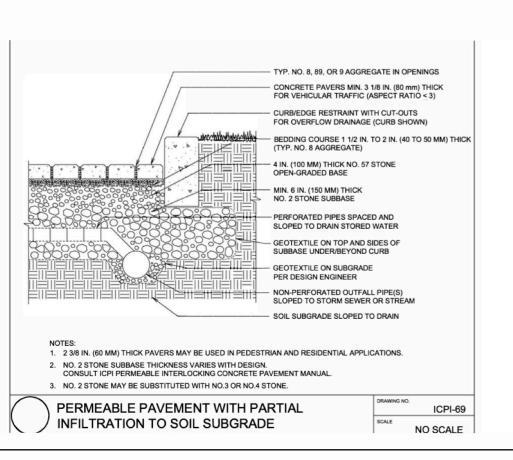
PERMEABLE PAVEMENT WITH PARTIAL INFILTRATION TO SOIL SUBGRADE
